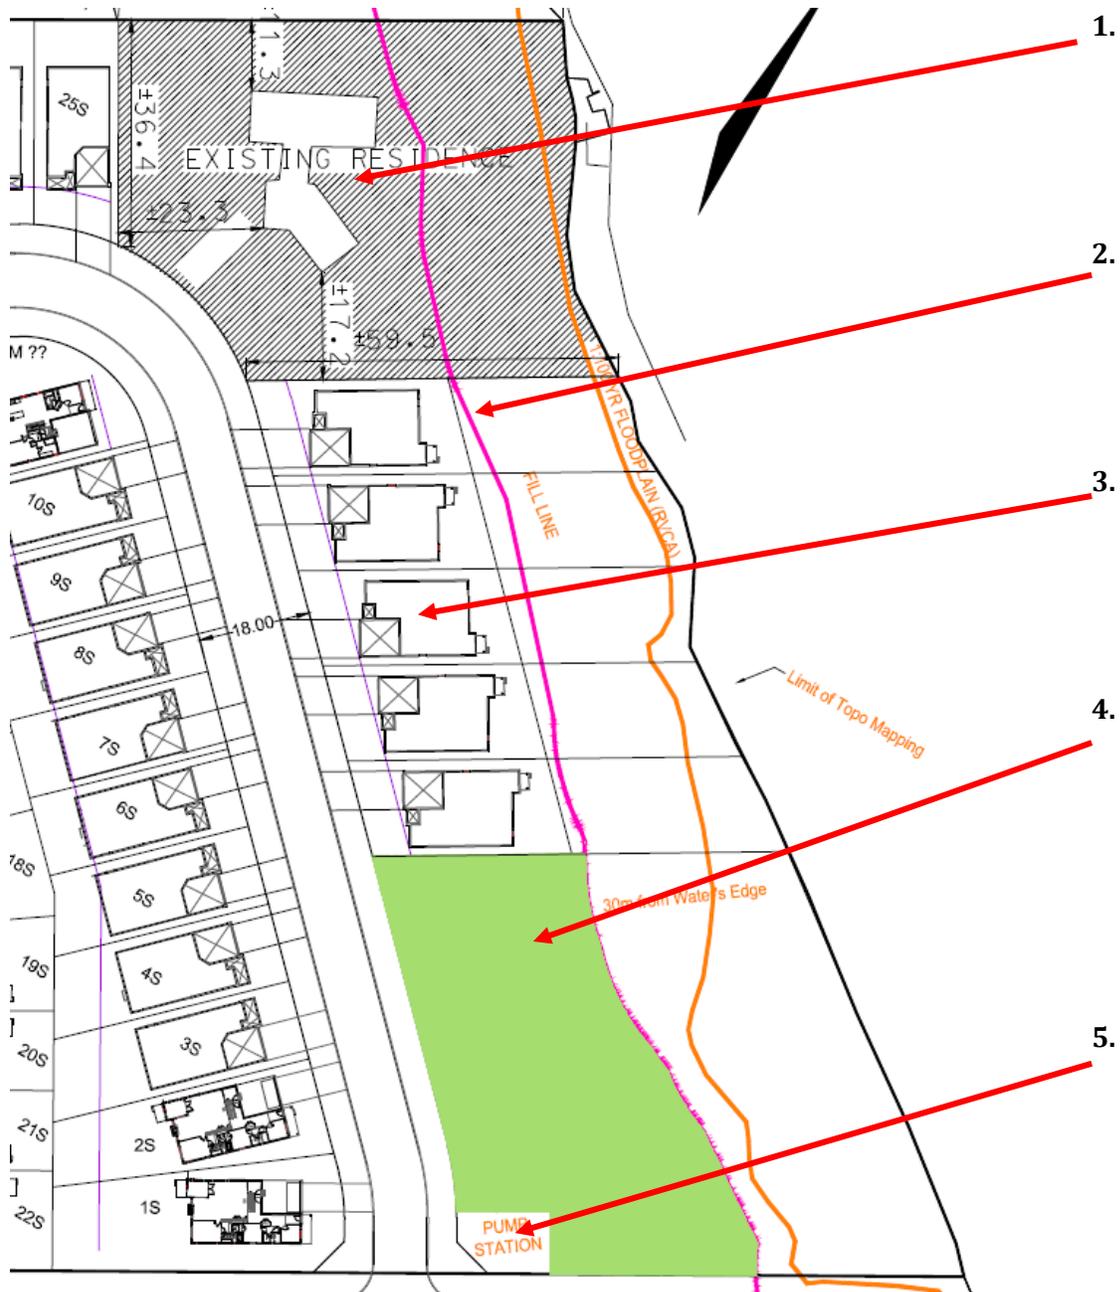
Detail from the Frontage Plan for the proposed development at 5721, 5731 and 5741 Manotick Main Street.
